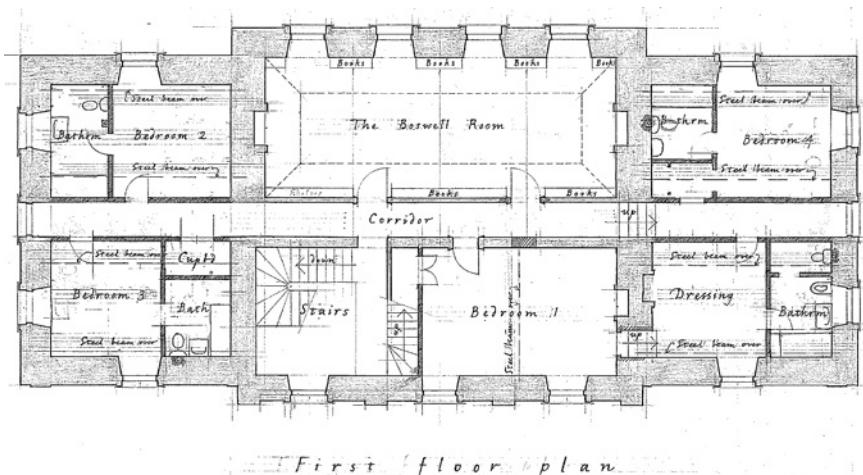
Detail from site plan of Auchinleck House, showing the placement of the 'Boswell Room' (former Library-Room), before restoration redevelopment by Landmark Trust.
